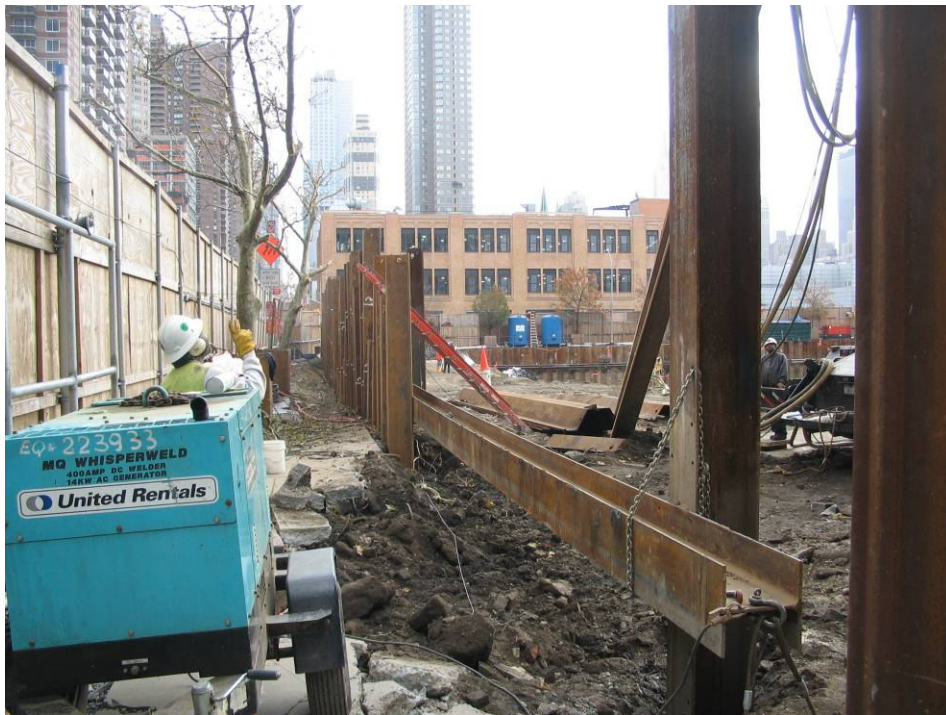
November 11, 2005 - Worker guiding grooved channels of sheeting sections together during installation.
